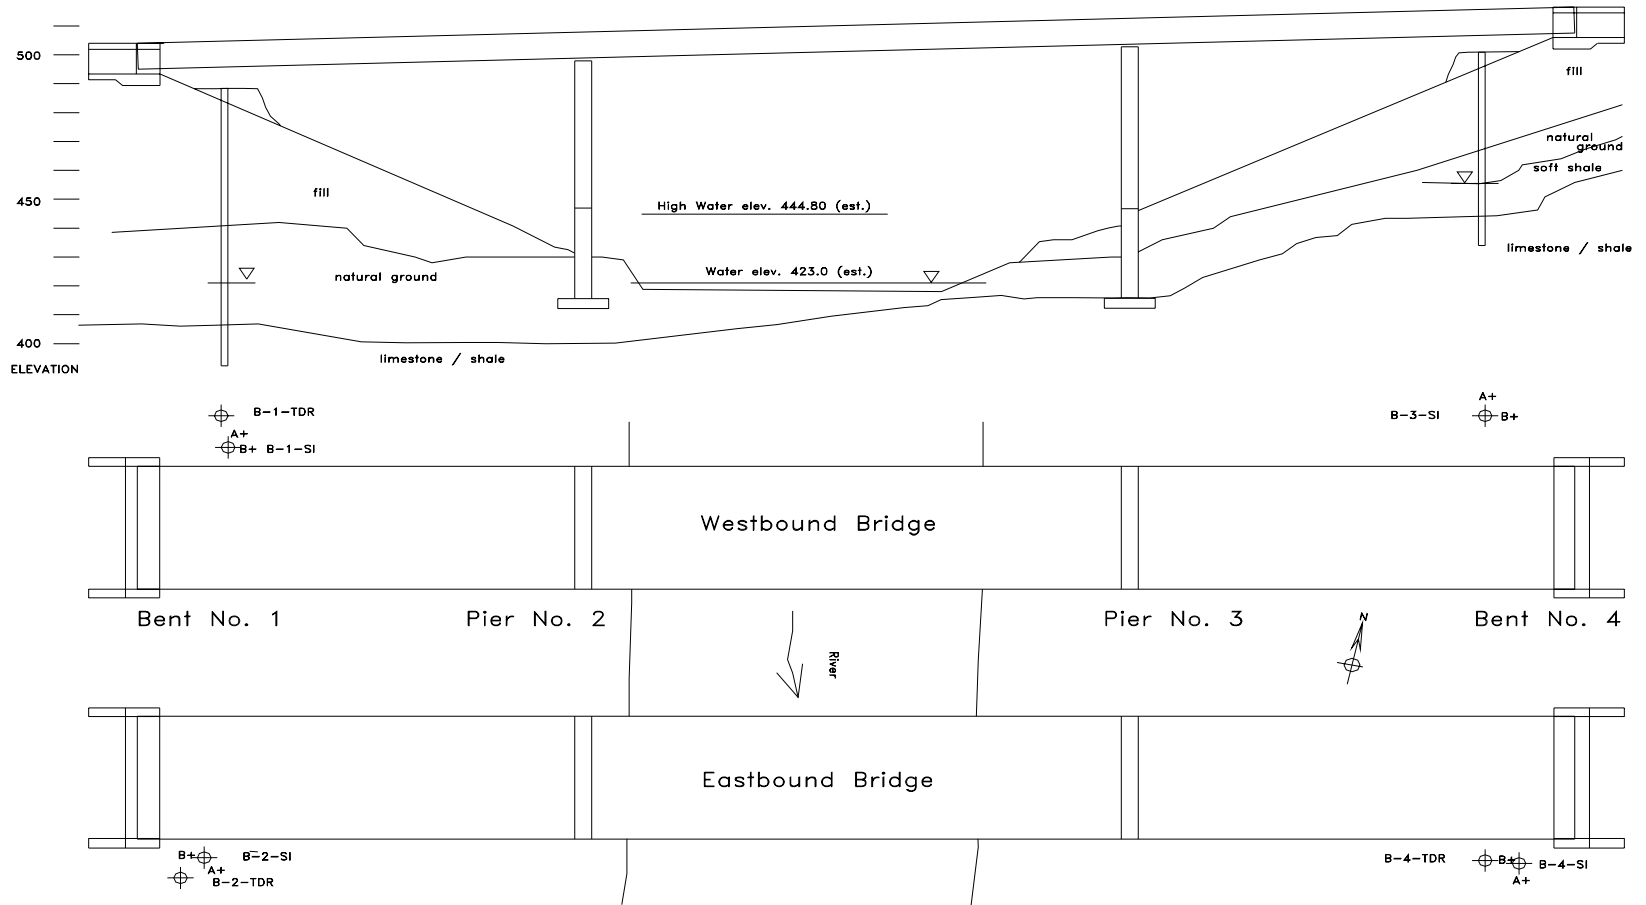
Plan view and elevation of the bridges on I-64 over the Little Blue river, Crawford County, Indiana.
